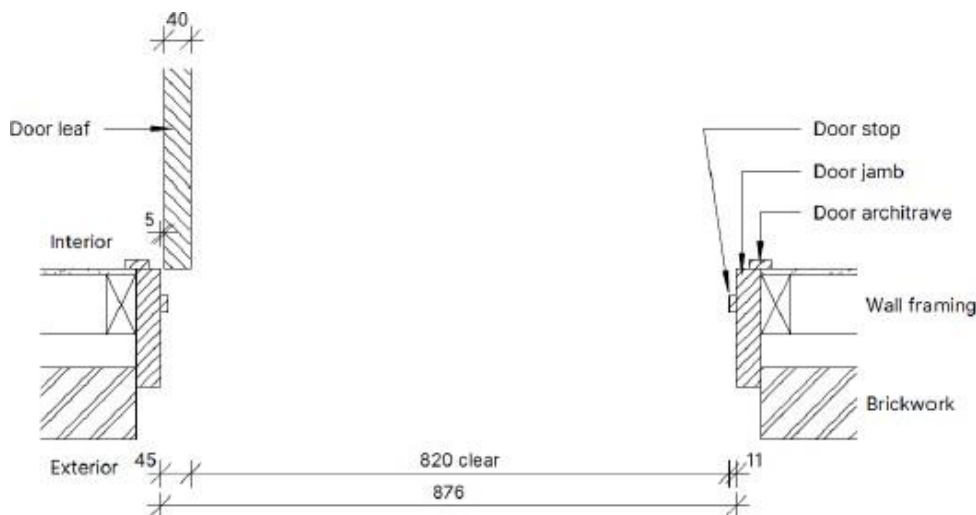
Plan view of a typical door frame with a swing door (dimensions in mm)
